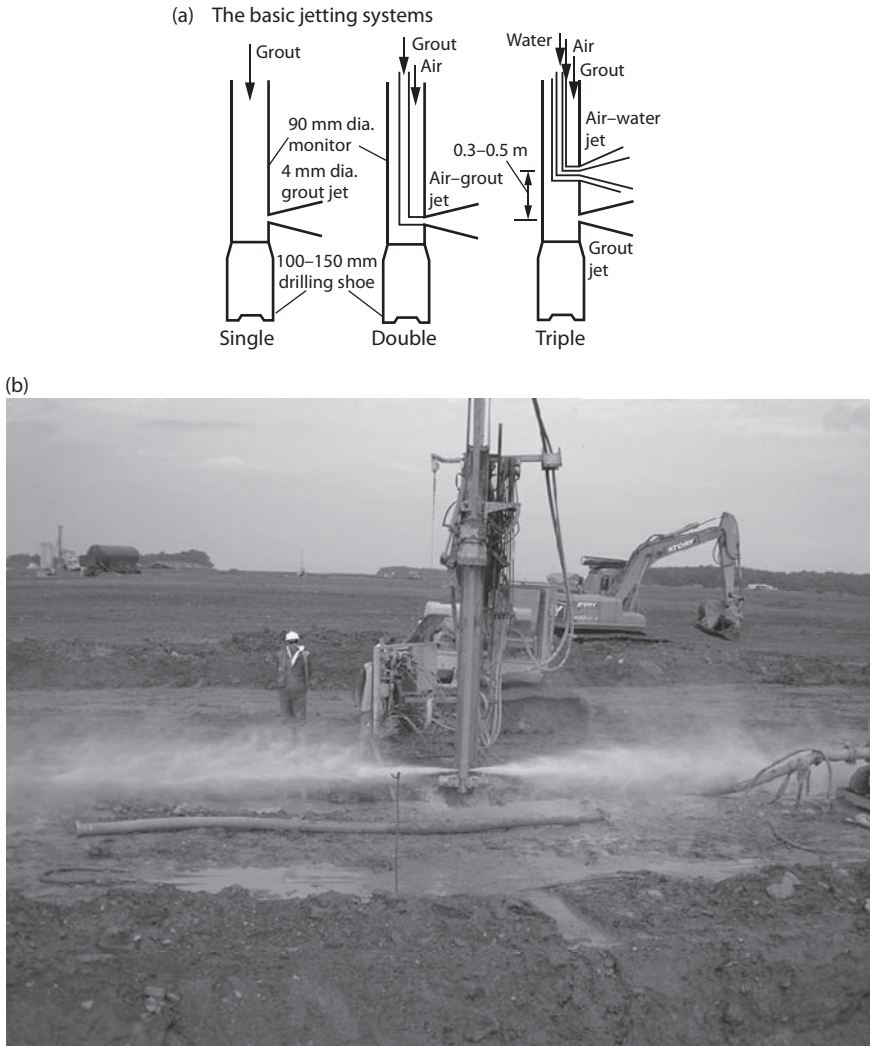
Jet grouting equipment. (a) Types of jet grouting systems. (From page 78 of Woodward, J., *An Introduction to Geotechnical Processes*, Spon Press, London, 2005. With permission.) (b) Jet grouting rig. The radial jets at the base of the drill string are shown operating above ground level. (Courtesy of Keller Geotechnique, Wetherby, U.K.)
